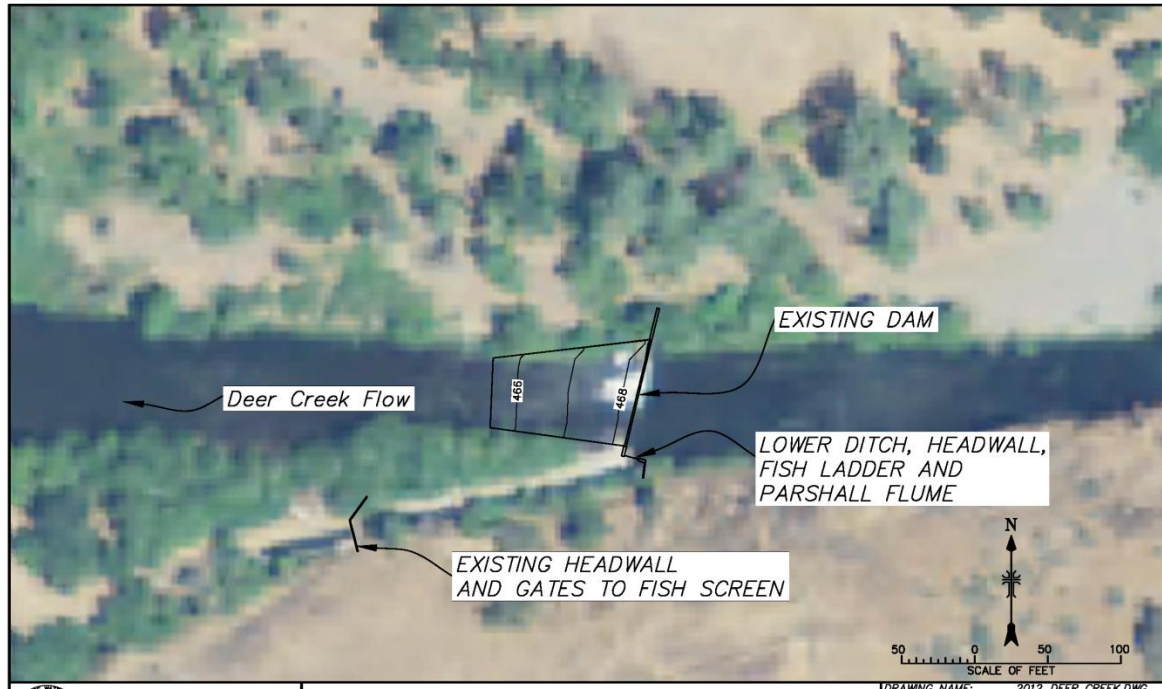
Alternative 5 Plan View– Lower ditch and construct rock ramp.
